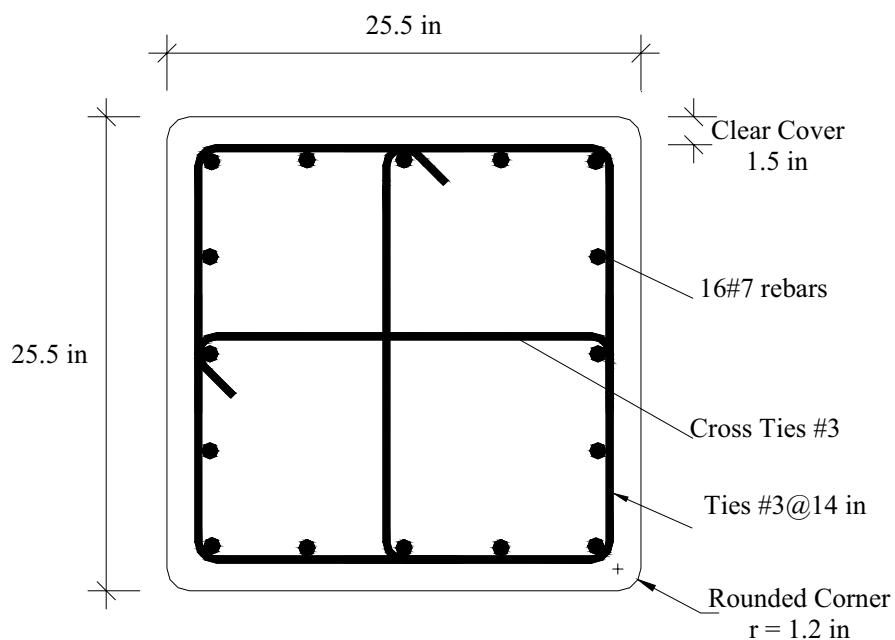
Section A-A & C-C; Specimens D1, D2 & D3
